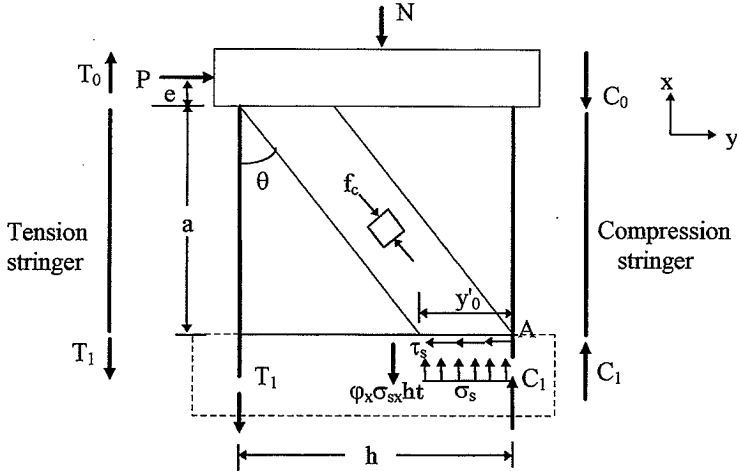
Shear wall with longitudinal reinforcement in the web loaded by transverse as well as normal forces
